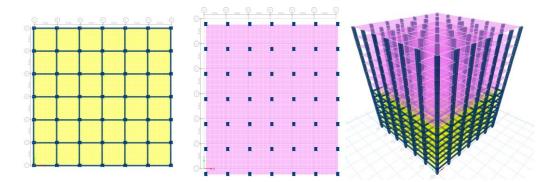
a. Plan view from Ground storey to 7th storey, b. Plan view from 8th storey to 15th storey and c. Elevation view of model CS+FS
